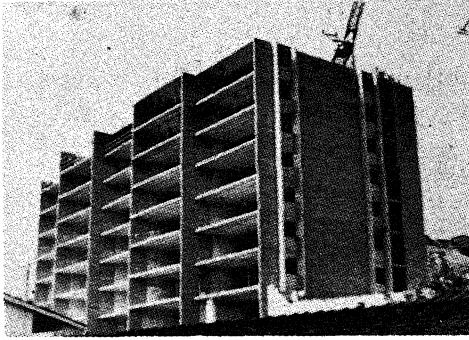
REINFORCED CONCRETE MASONRY BUILDING
